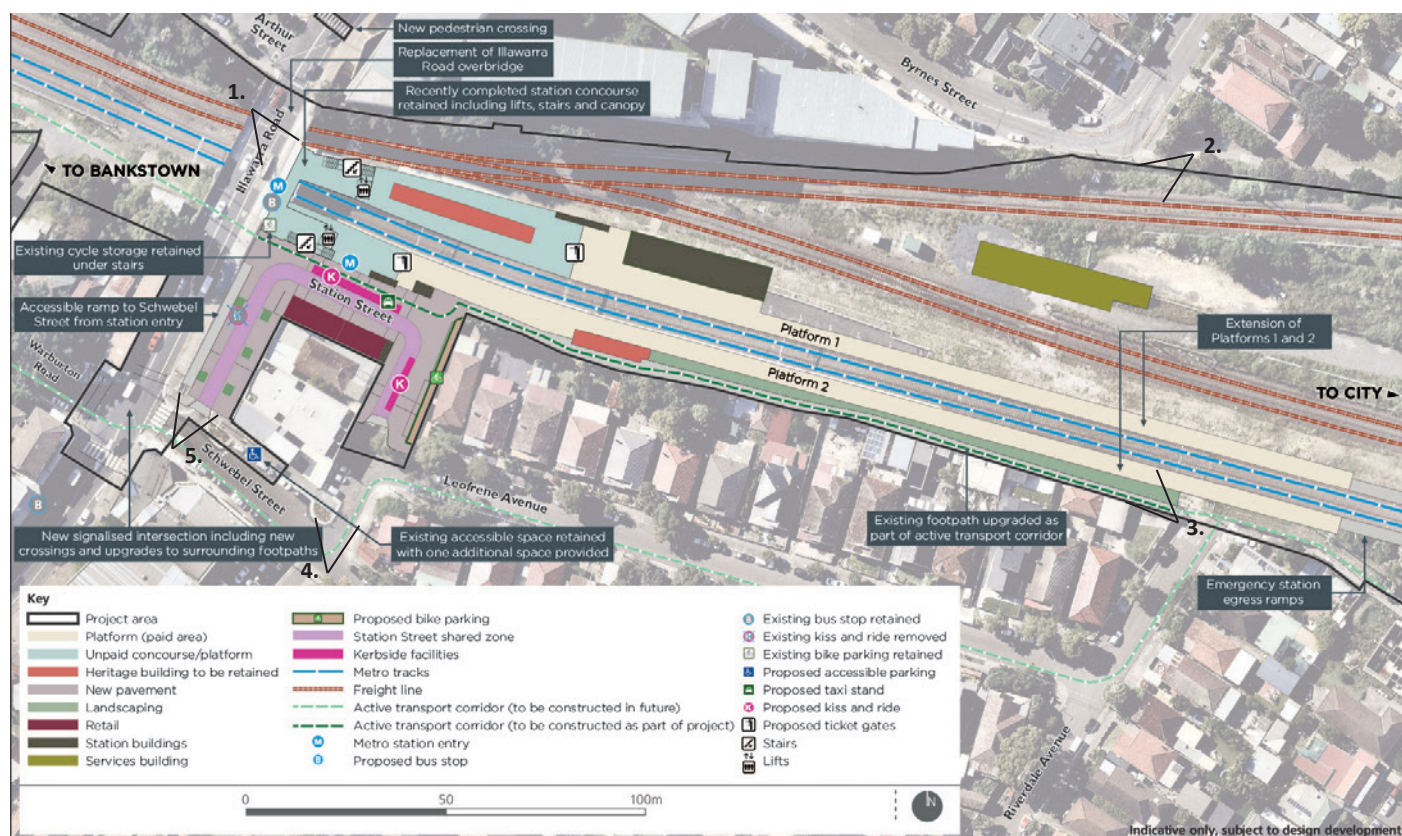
VIEWPOINT LOCATION PLAN
